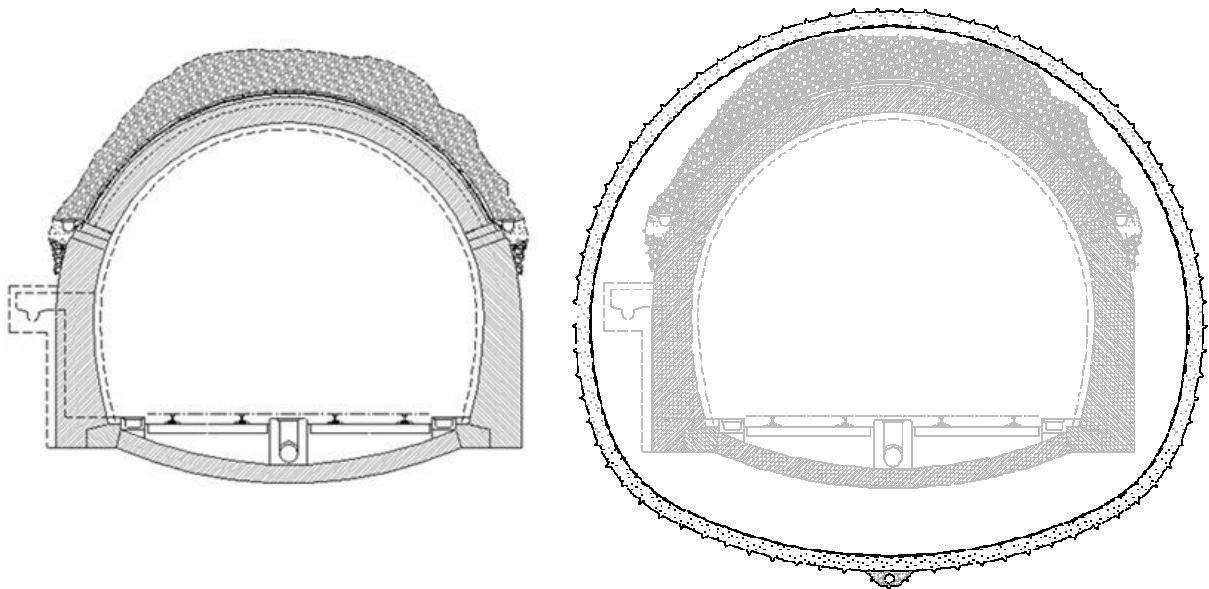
Old and new cross section of the „Alte Mainzer Tunnel“ (source: Beton- und Monierbau)
